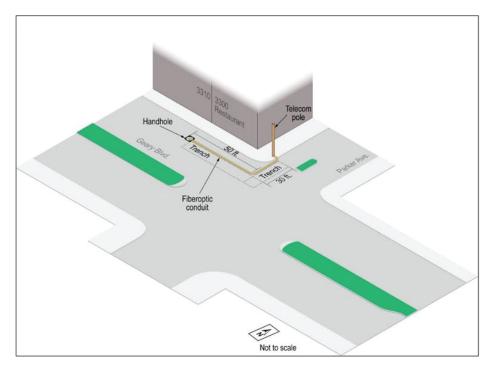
Excavation work plan for 2/6/19. Courtesy NTSB.
